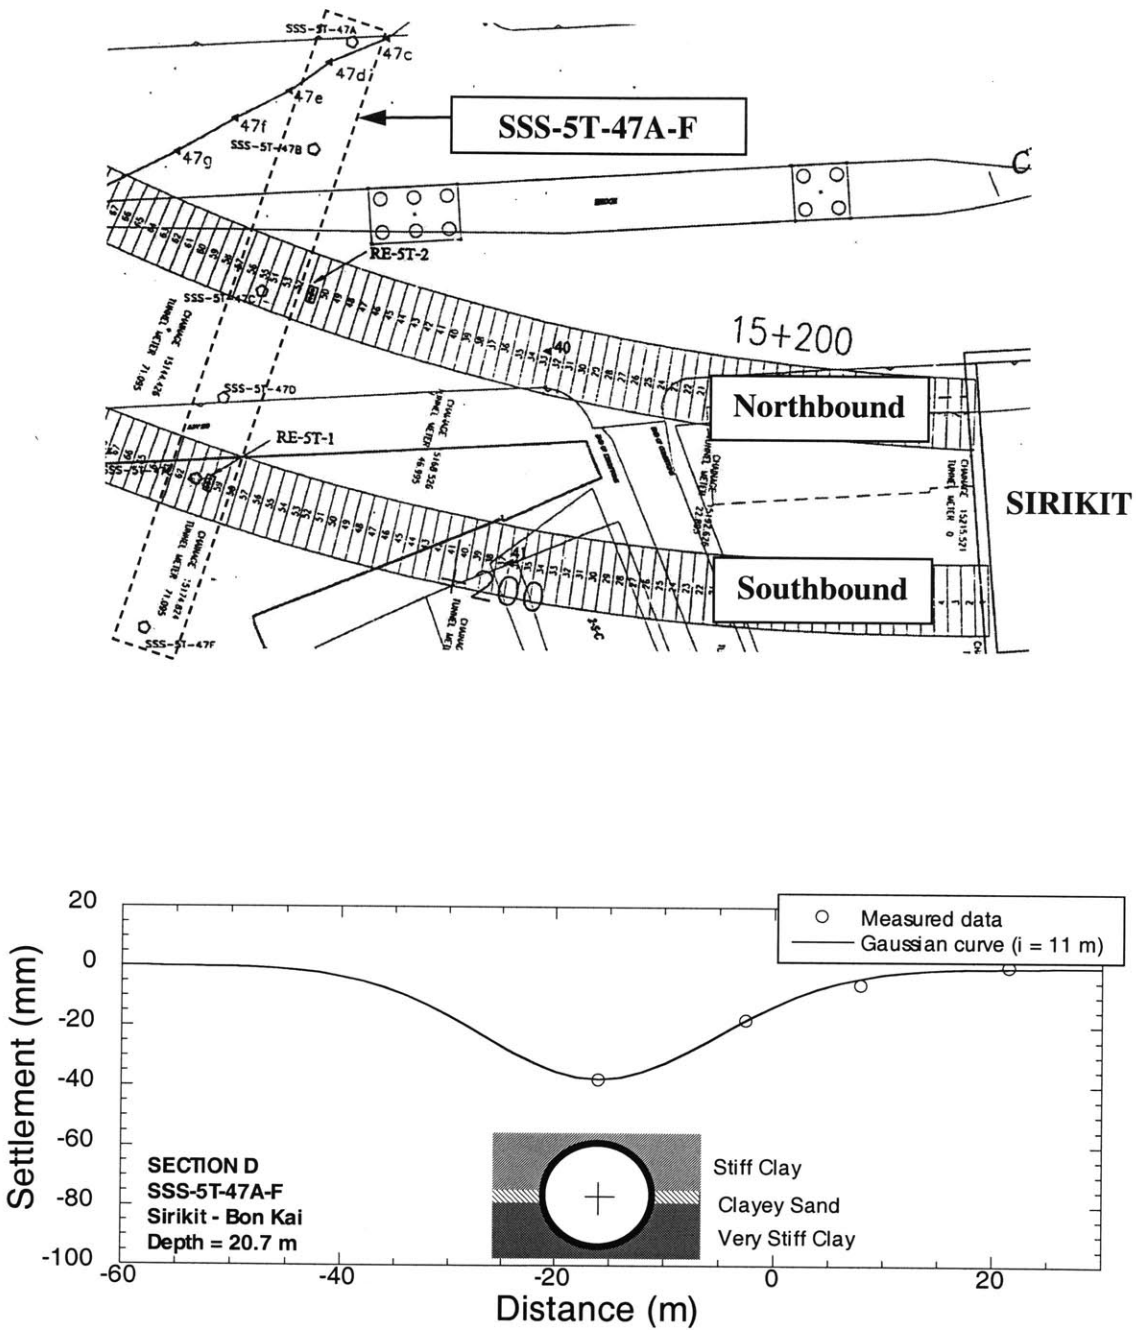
Surface settlement trough measured on SSS-5T-47A-F (southbound tunnel-Ring no.61) and the instrumentation layout
